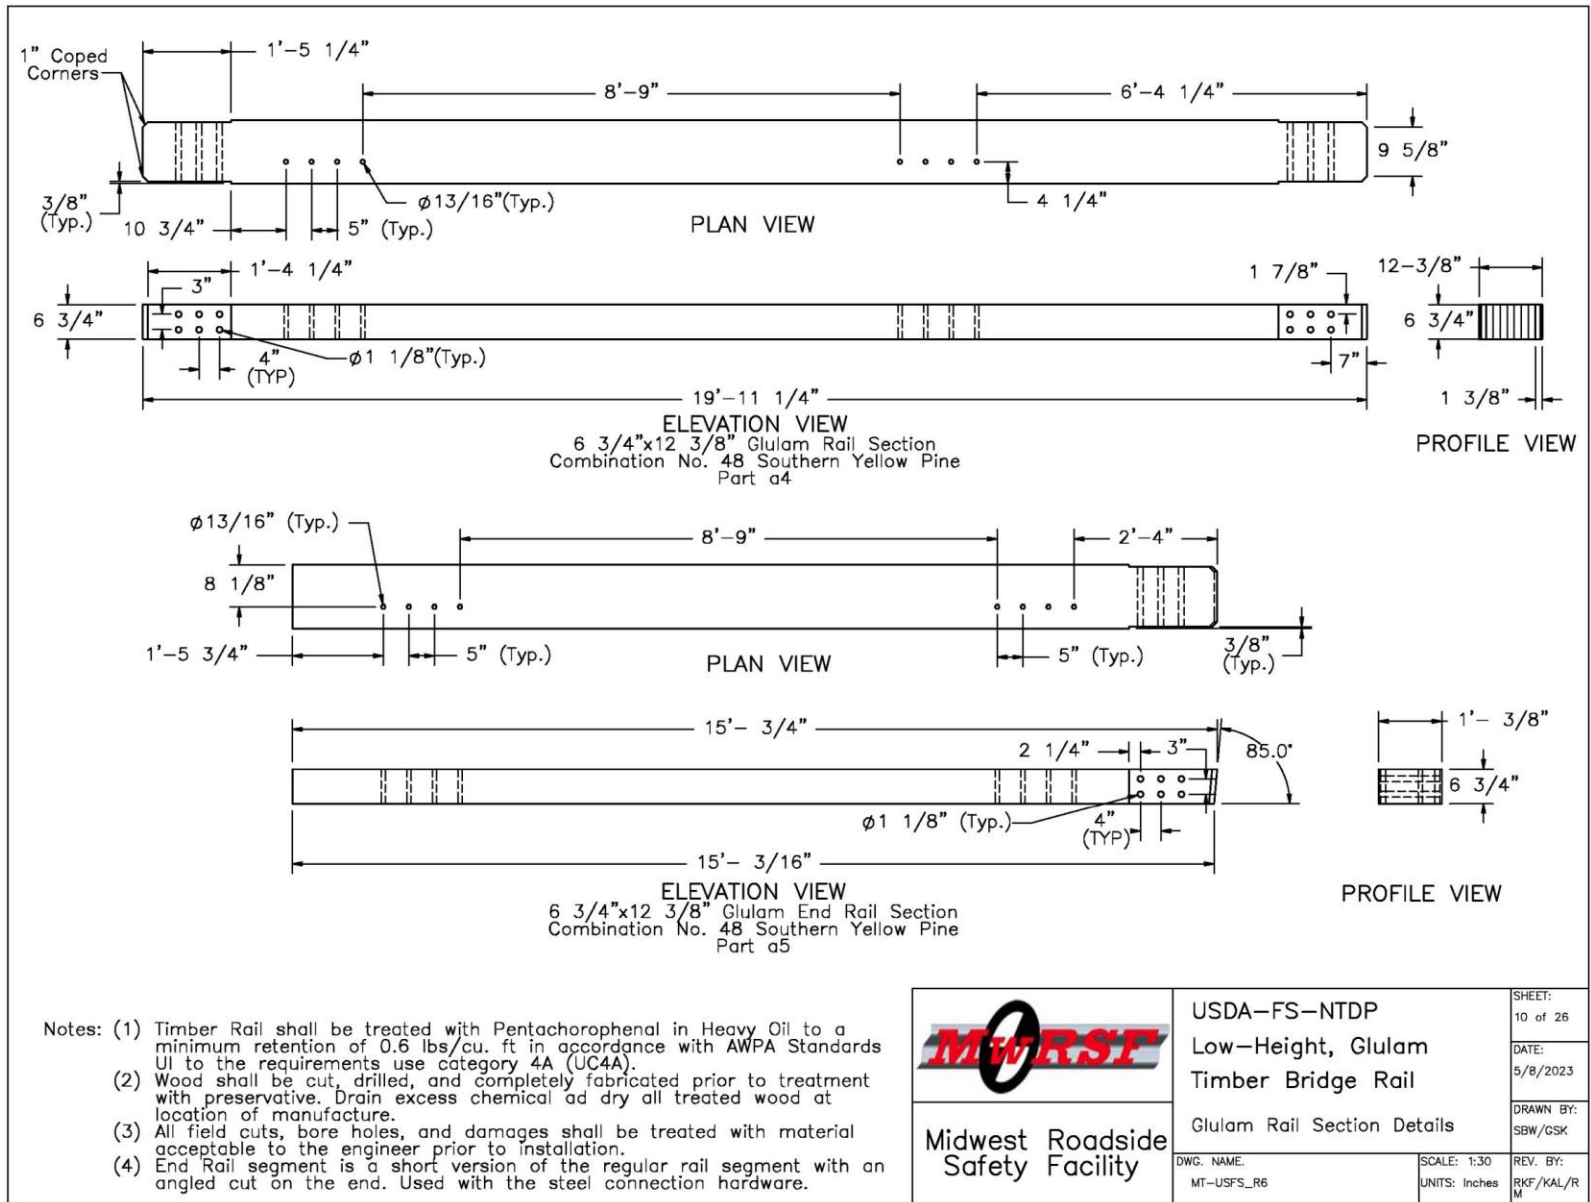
USDA-FS-NTDP Low-Height, Glulam Timber Bridge Rail: Glulam Rail Section Details
